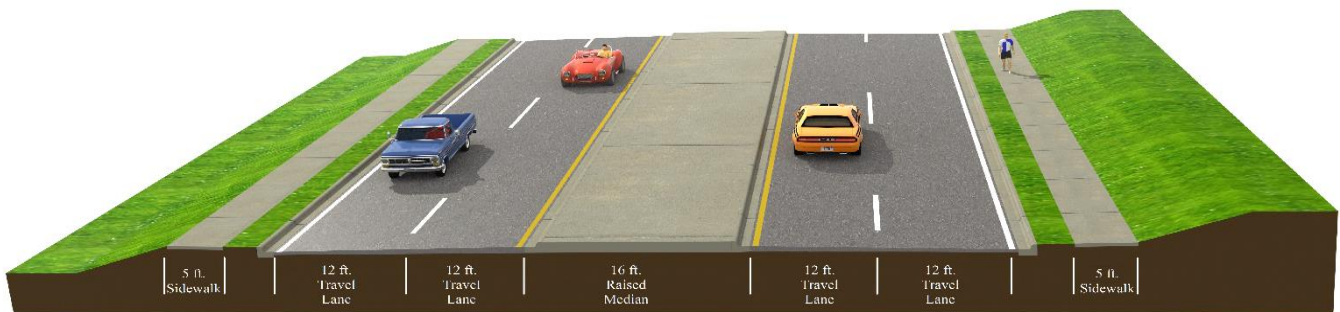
Typical Cross Section: Four Lanes with Raised Median
